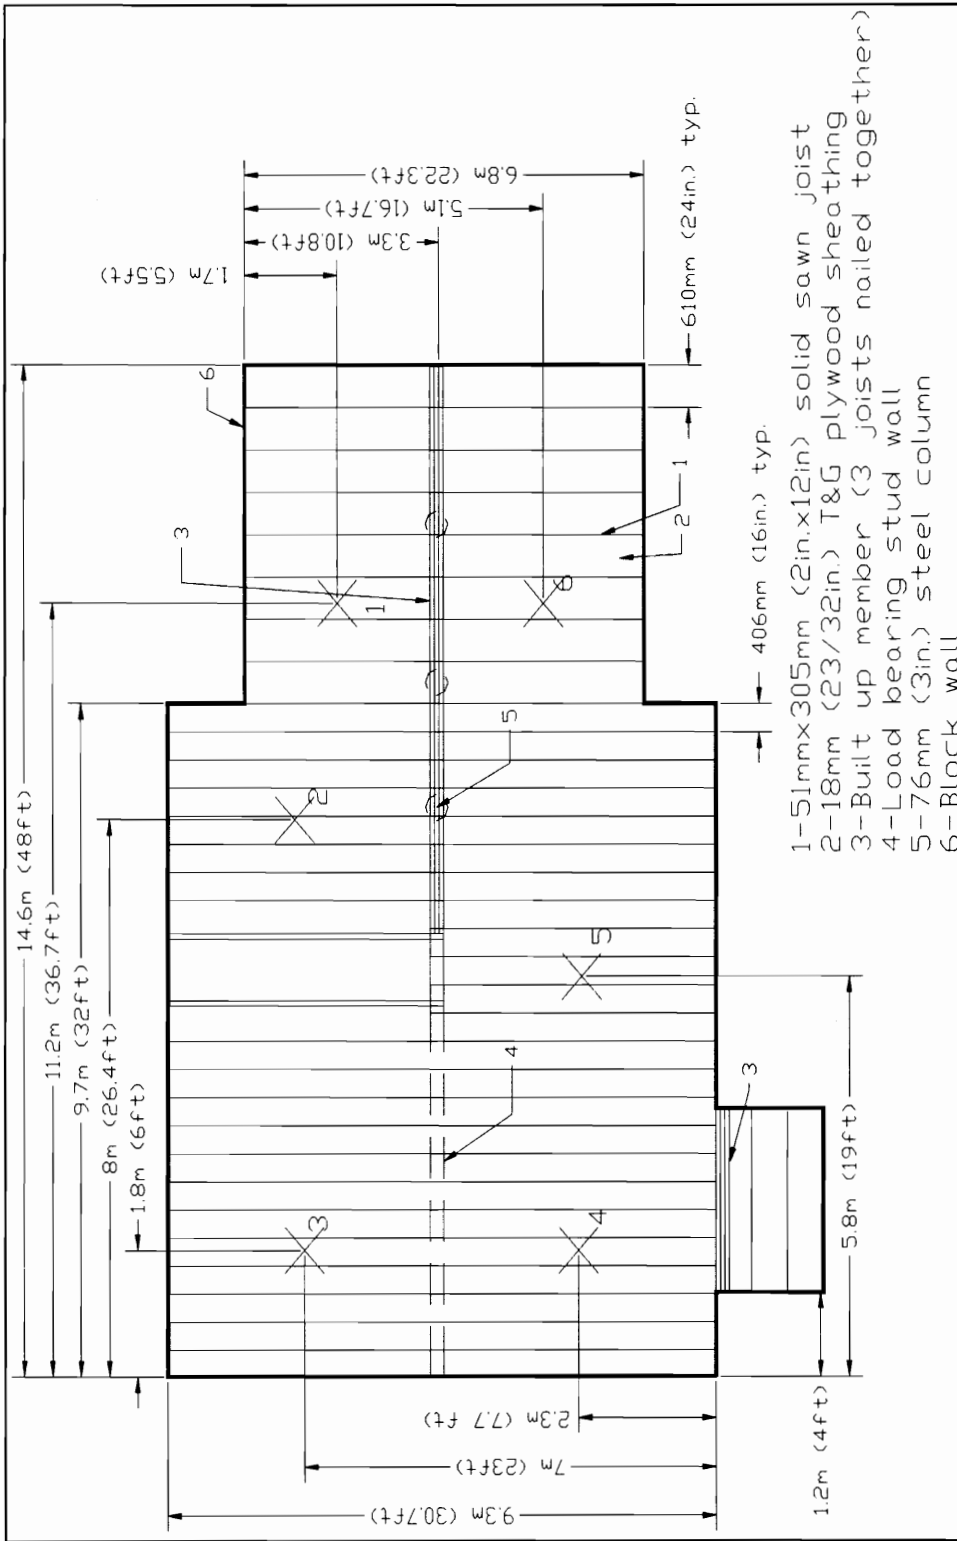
Structural Plan of Solid Sawn Joist House #1
